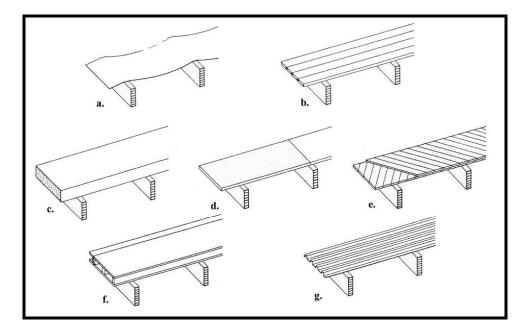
Roof decking arrangements are: a) Fabric or plastic roof on braced beams, b) Tongue or groove planking or splined boards, c) Composite materials, d) Wood chipboards, plywood or furniture panels, e) Diagonal planking, f) Panel elements of timber slats or sheating, g) Trapezoidal sheet metal (Götz *et al.*, 1989:127).
